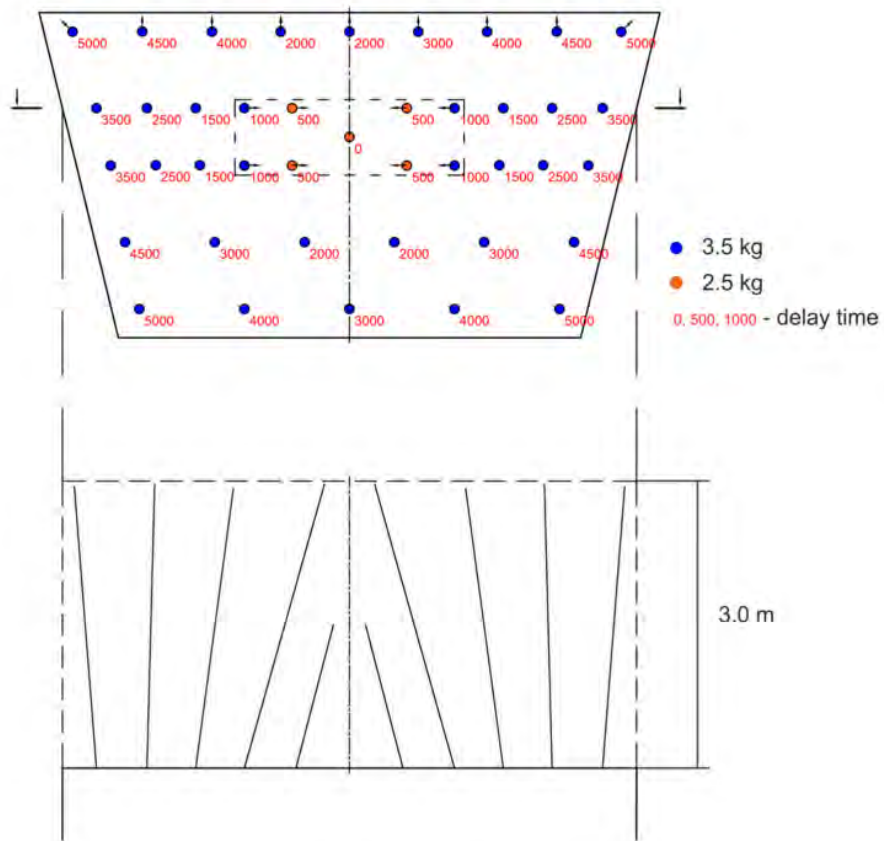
Drilling face blasting pattern: cross-section (upper), topside view (lower) [172]
